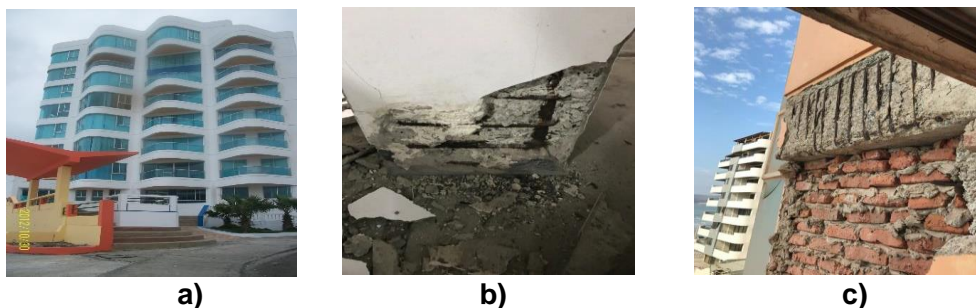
(a) The Vigia Building of 10 floors of HA; (b) Lost of covering in parking's column, strong corrosion in the rods of reinforcement; (c) High corrosion index in girders of elevator, stirrup without confinement.
